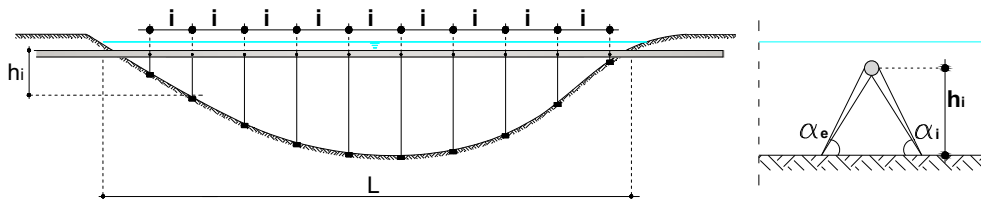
Geometrical configuration of a Submerged Floating Tunnel
